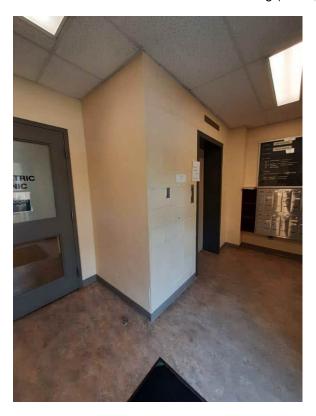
115 Delhi Street – Level 4– Stairwell C (4039) - September 23, 2023. Plaster walls confirmed as non-asbestos-containing in 2012 (S04A, B, C).
